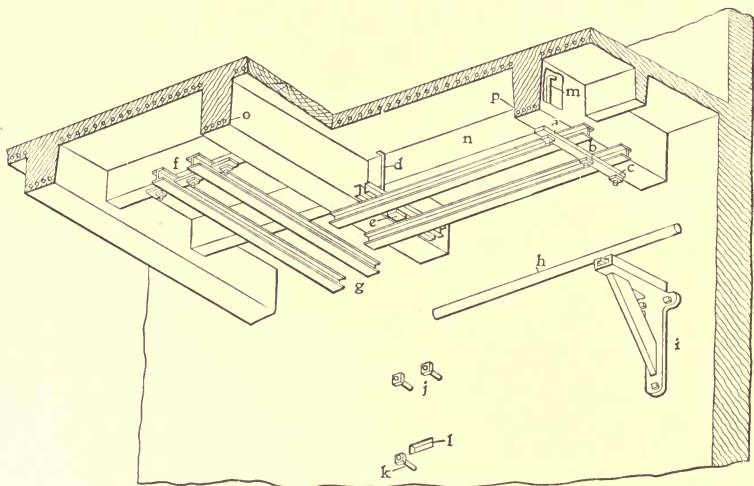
HANGING SHAFTING ON REINFORCED CONCRETE.
